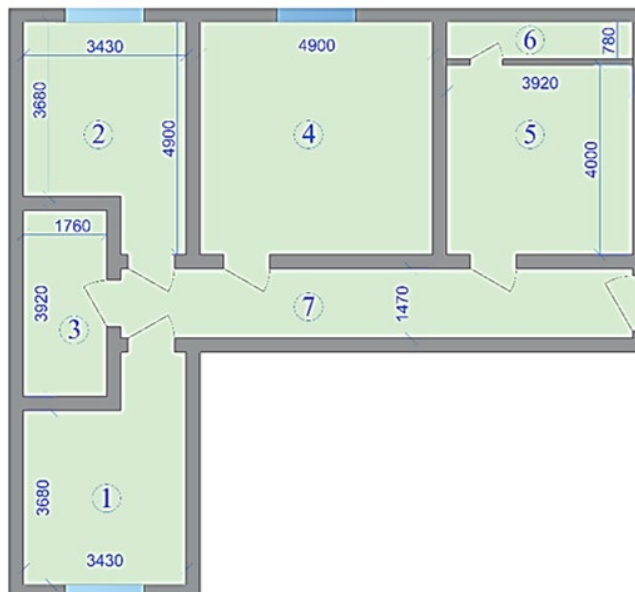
Plan of the apartment studied on the fifth floor: 1 – north-oriented bedroom (No.1); 2 – south-oriented bedroom (No.2); 3 – bathroom; 4 – hall; 5 – kitchen; 6 – balcony.
